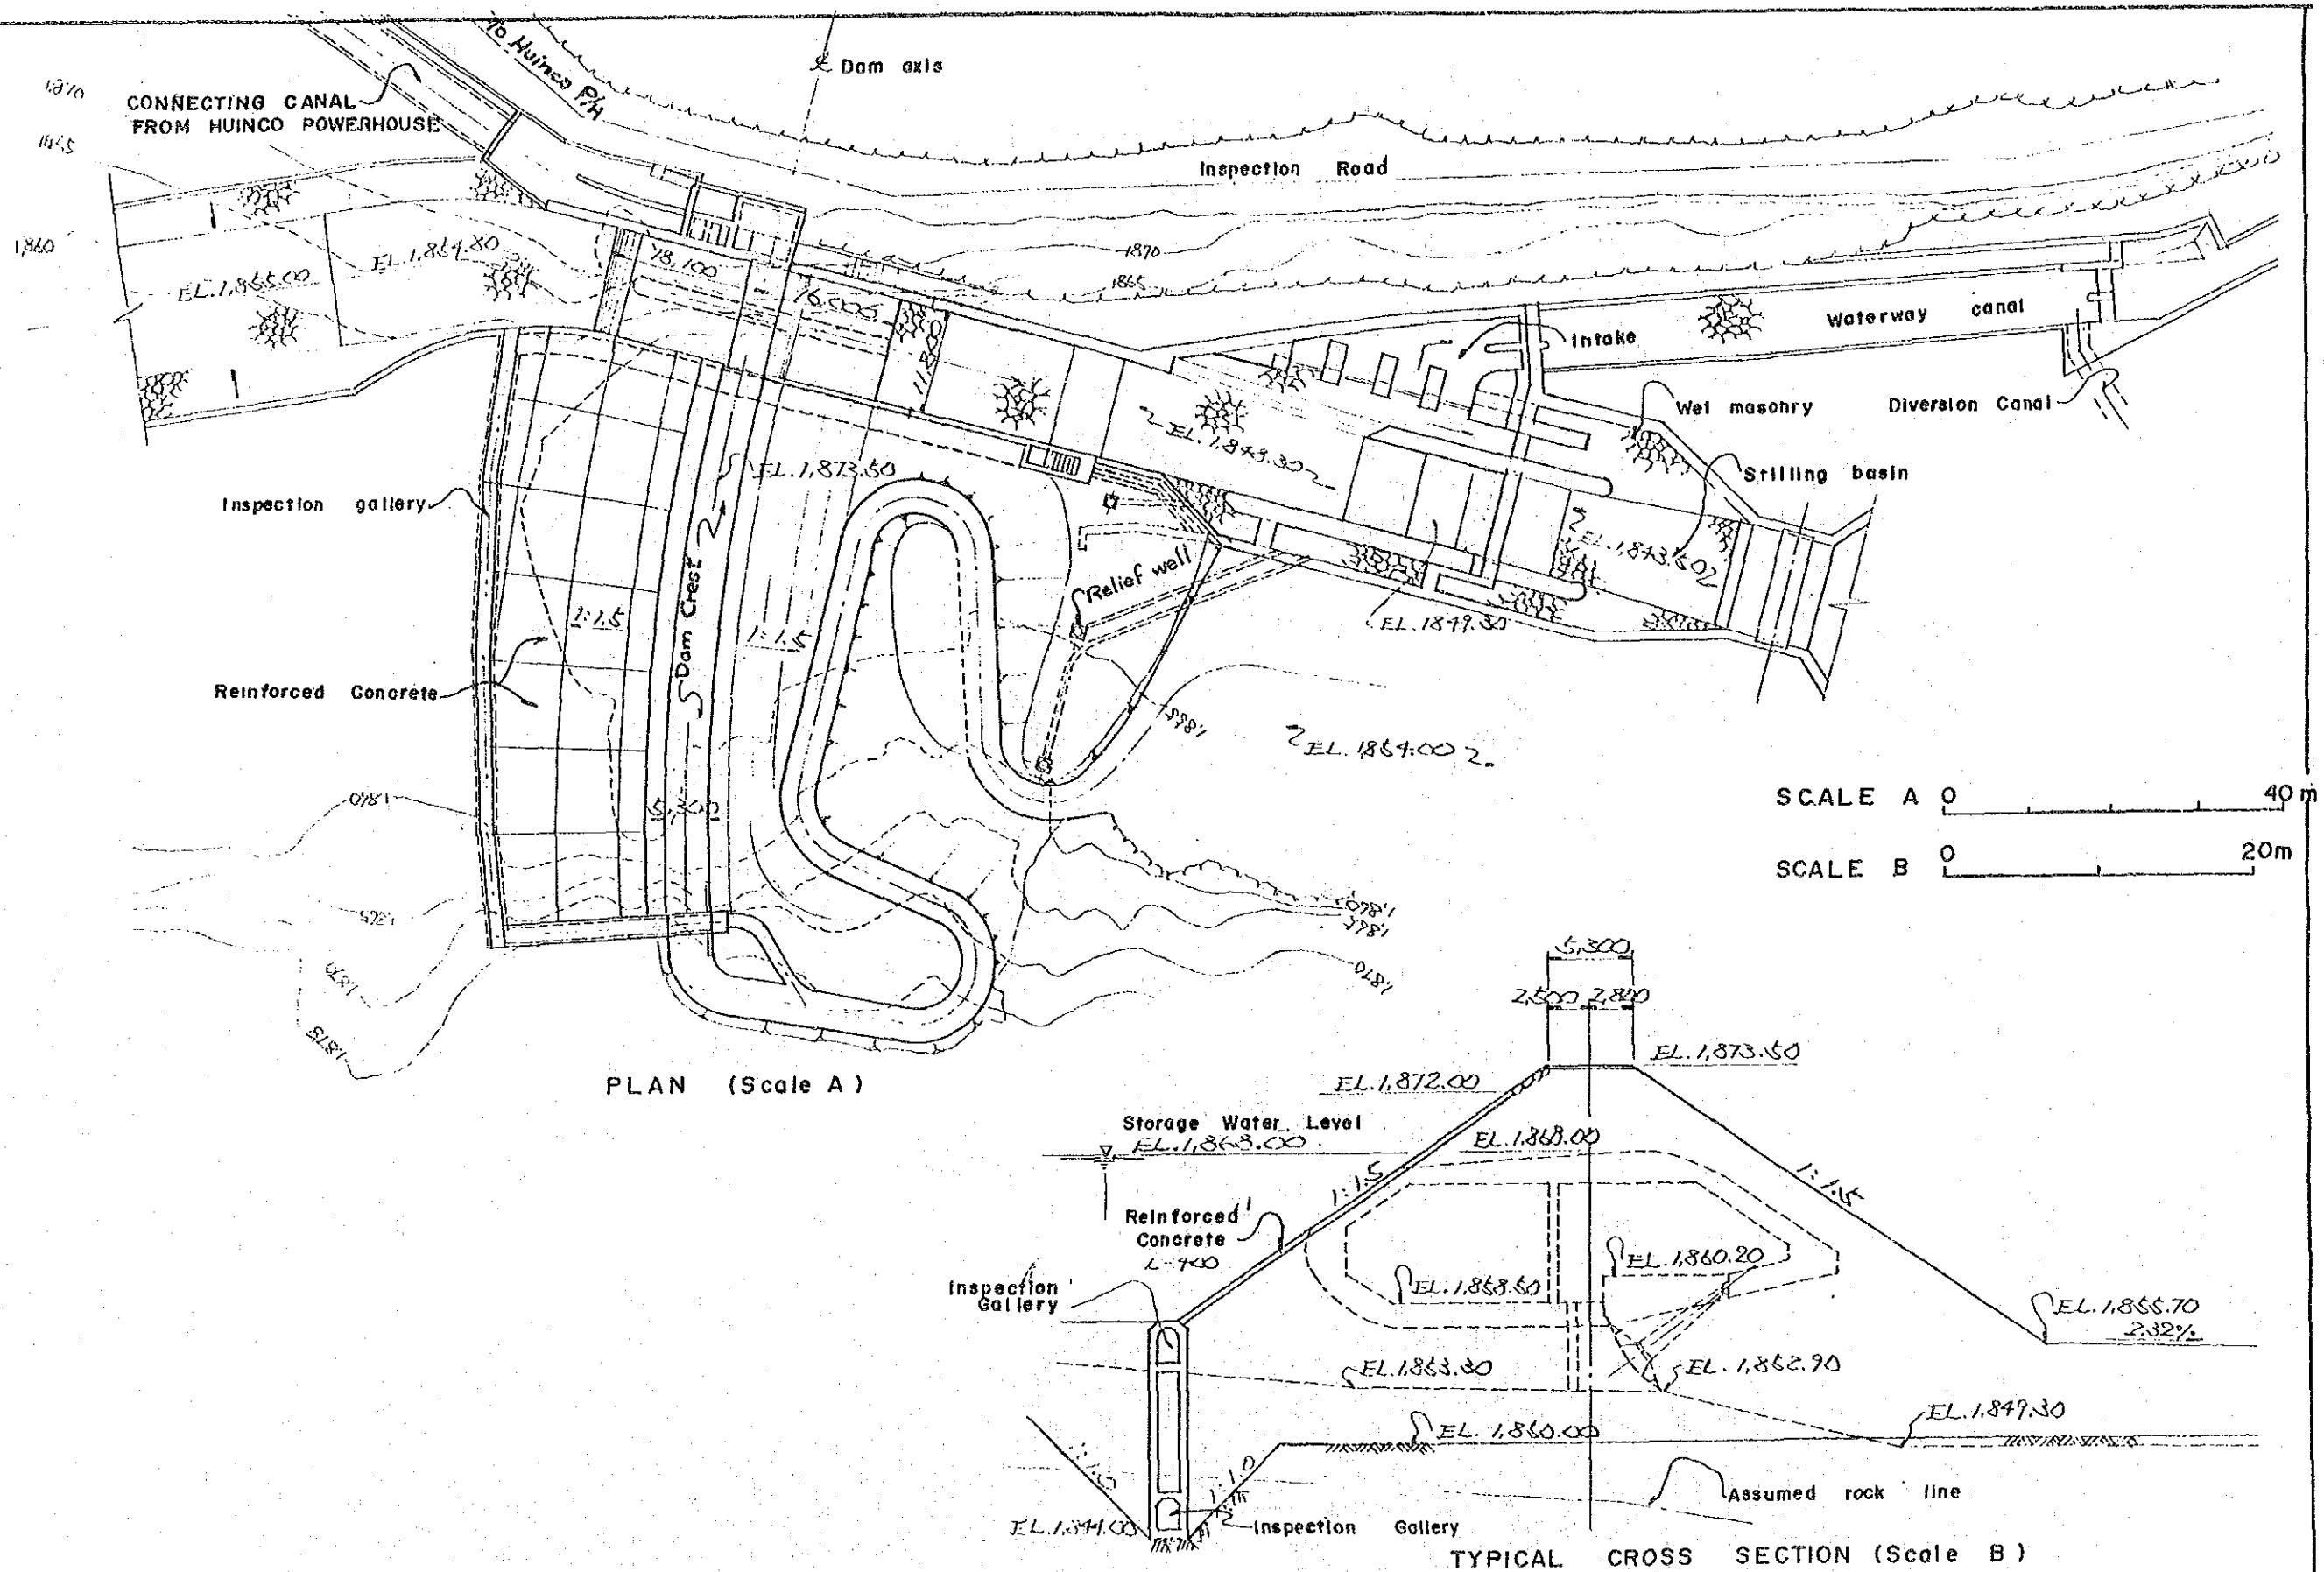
PLAN AND TYPICAL CROSS SECTION OF HUINCO DAM
